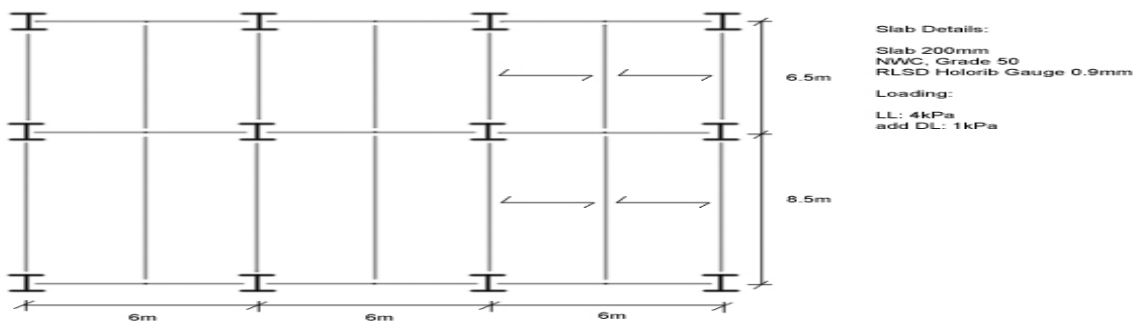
Example 2: Dimensions of a typical bay, details and loading of slab
